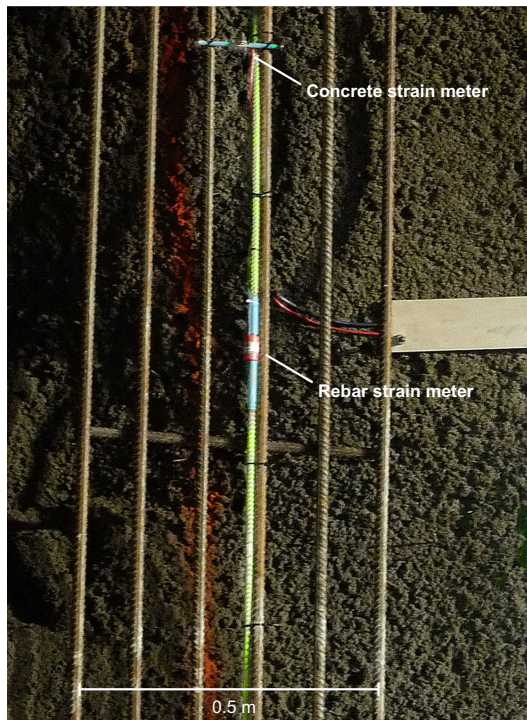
Concrete and rebar strain meters mounted on the rib before the application of sprayed concrete
